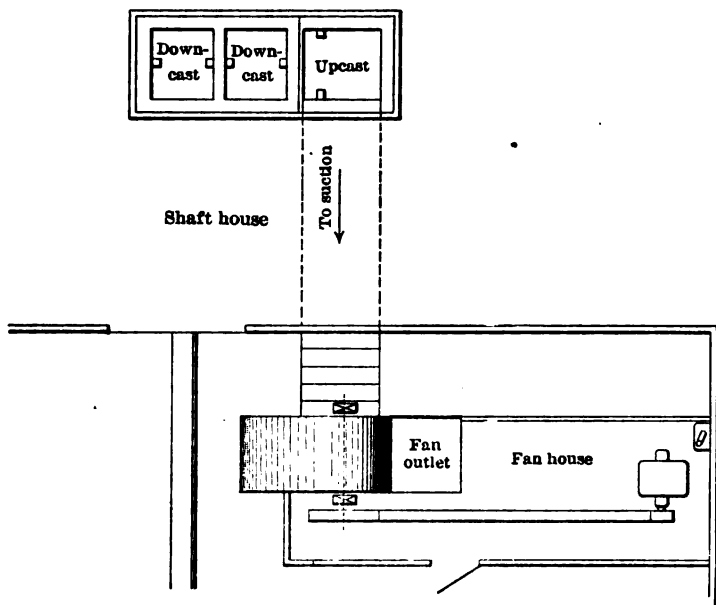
PLAN OF FAN AT WARD SHAFT.
